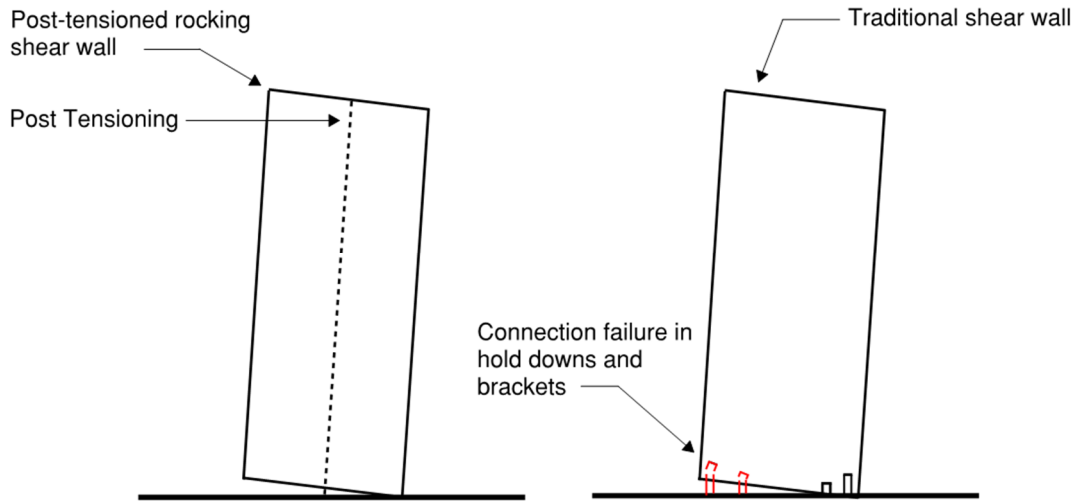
Rocking Motion in (a) PT Shear Wall and (b) Traditional Shear Wall
